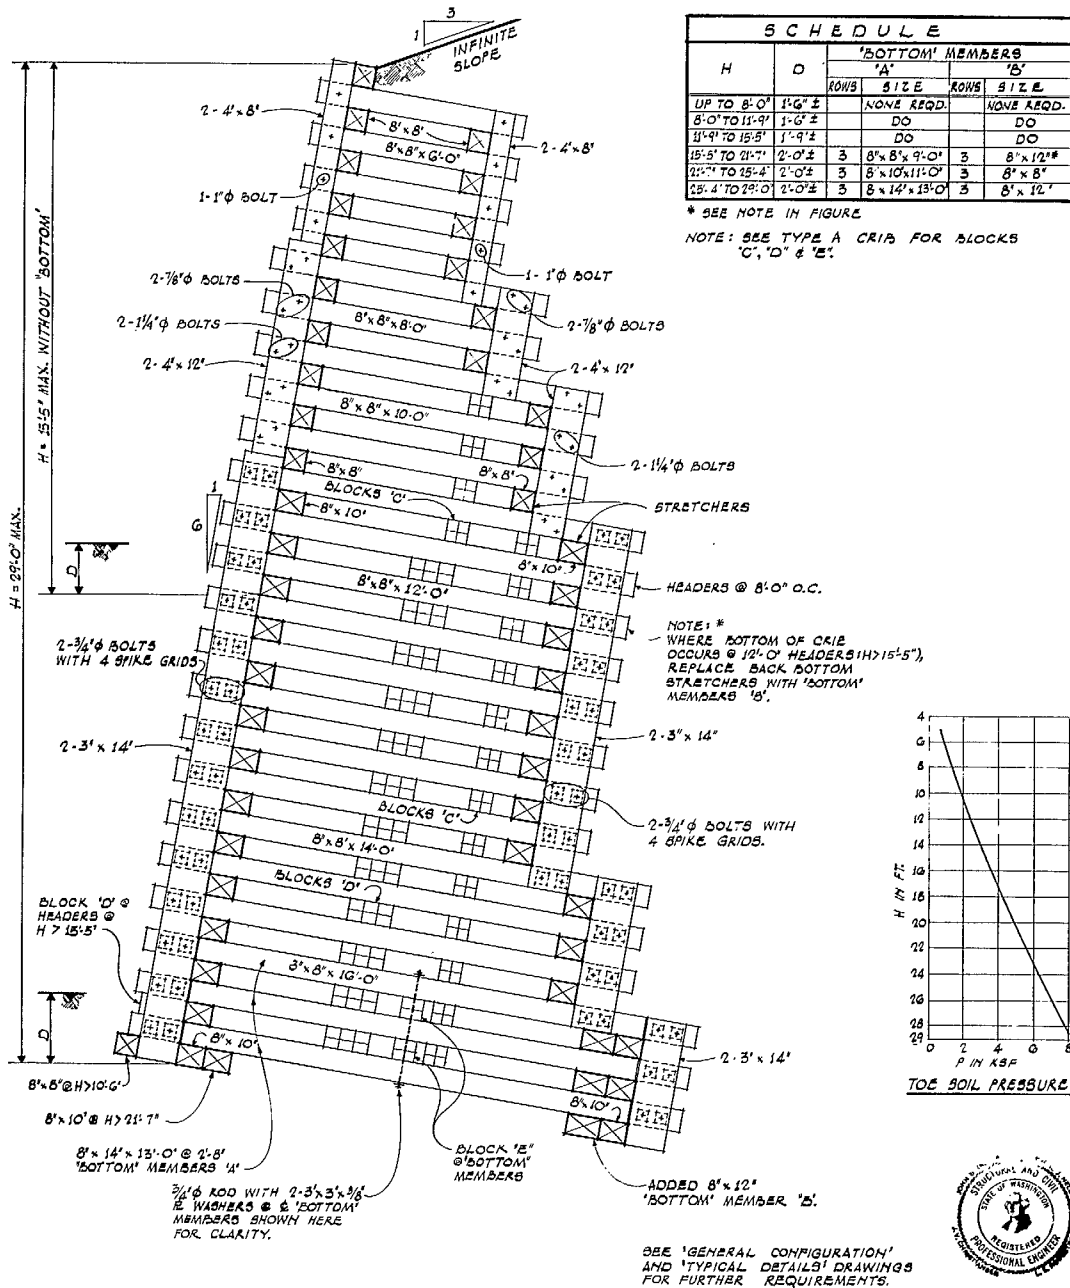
Crib-type retaining wall and back-fill geometry (10).
